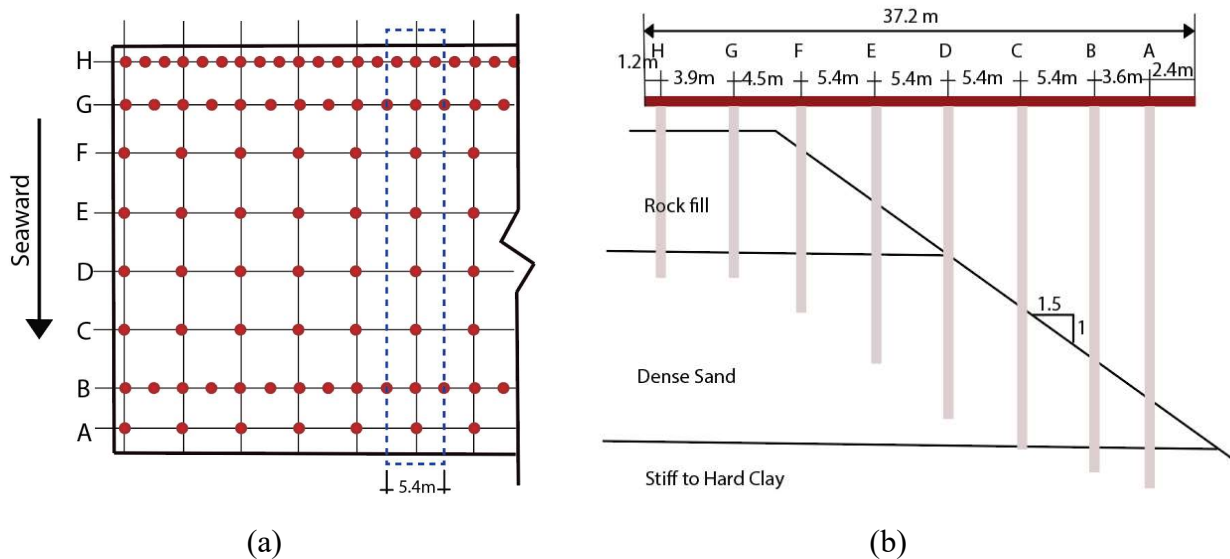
Profile of a wharf: a) plan view; b) section view. (Yang et al. 2012)
